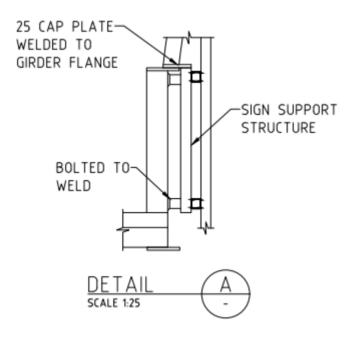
Detail (Source: Dennis Bunt Consulting Engineers)
